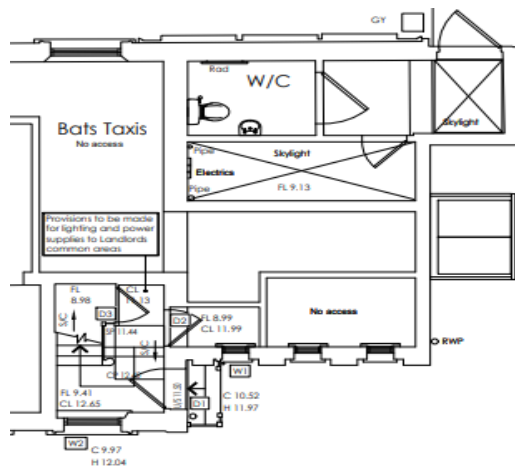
Area work plan for refurbishment on Ground Floor arrangements.
